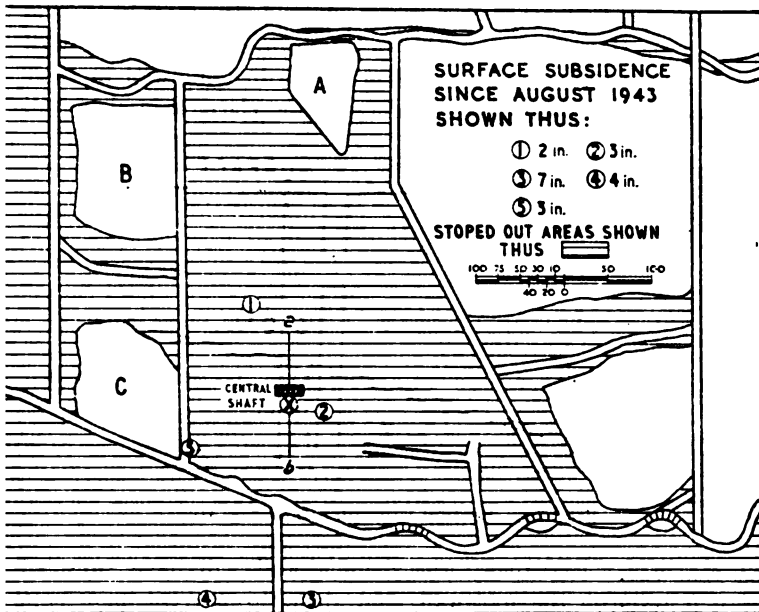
Plan as at 30th June, 1944, to date (25th April, 1946).
